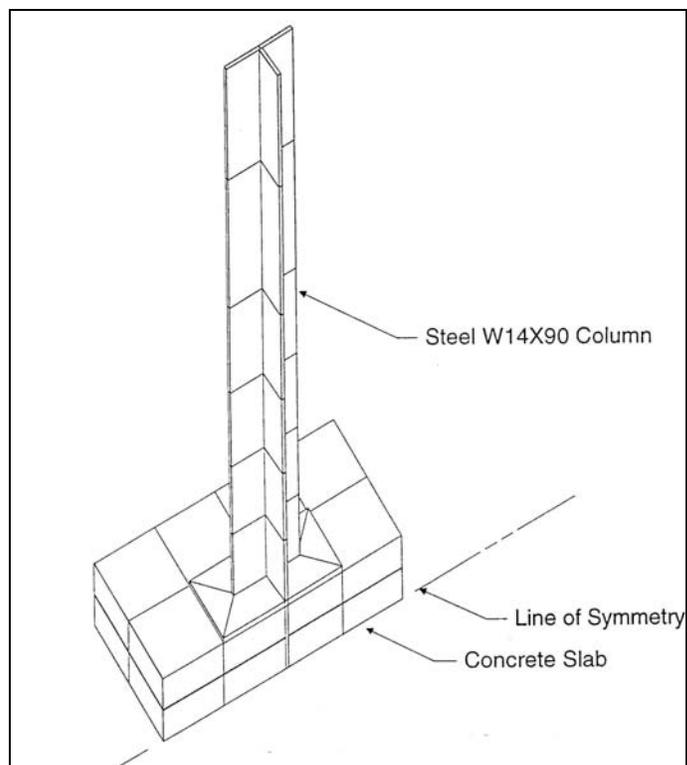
Column, Adjacent Base Plate and Floor Slab Discretized into Finite Element Mesh.
